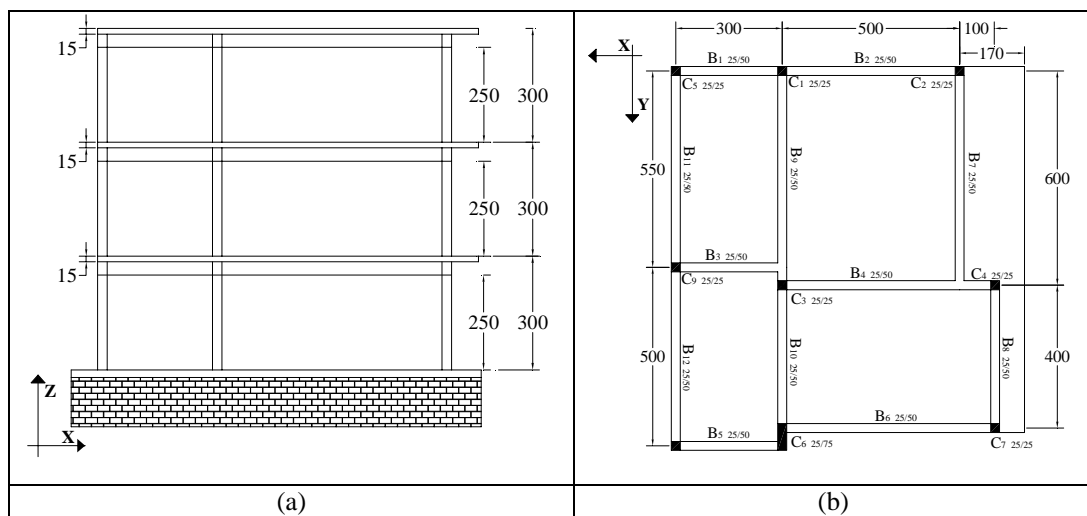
Structure elevation (a) and plan (b) view, (dimensions in cm).
